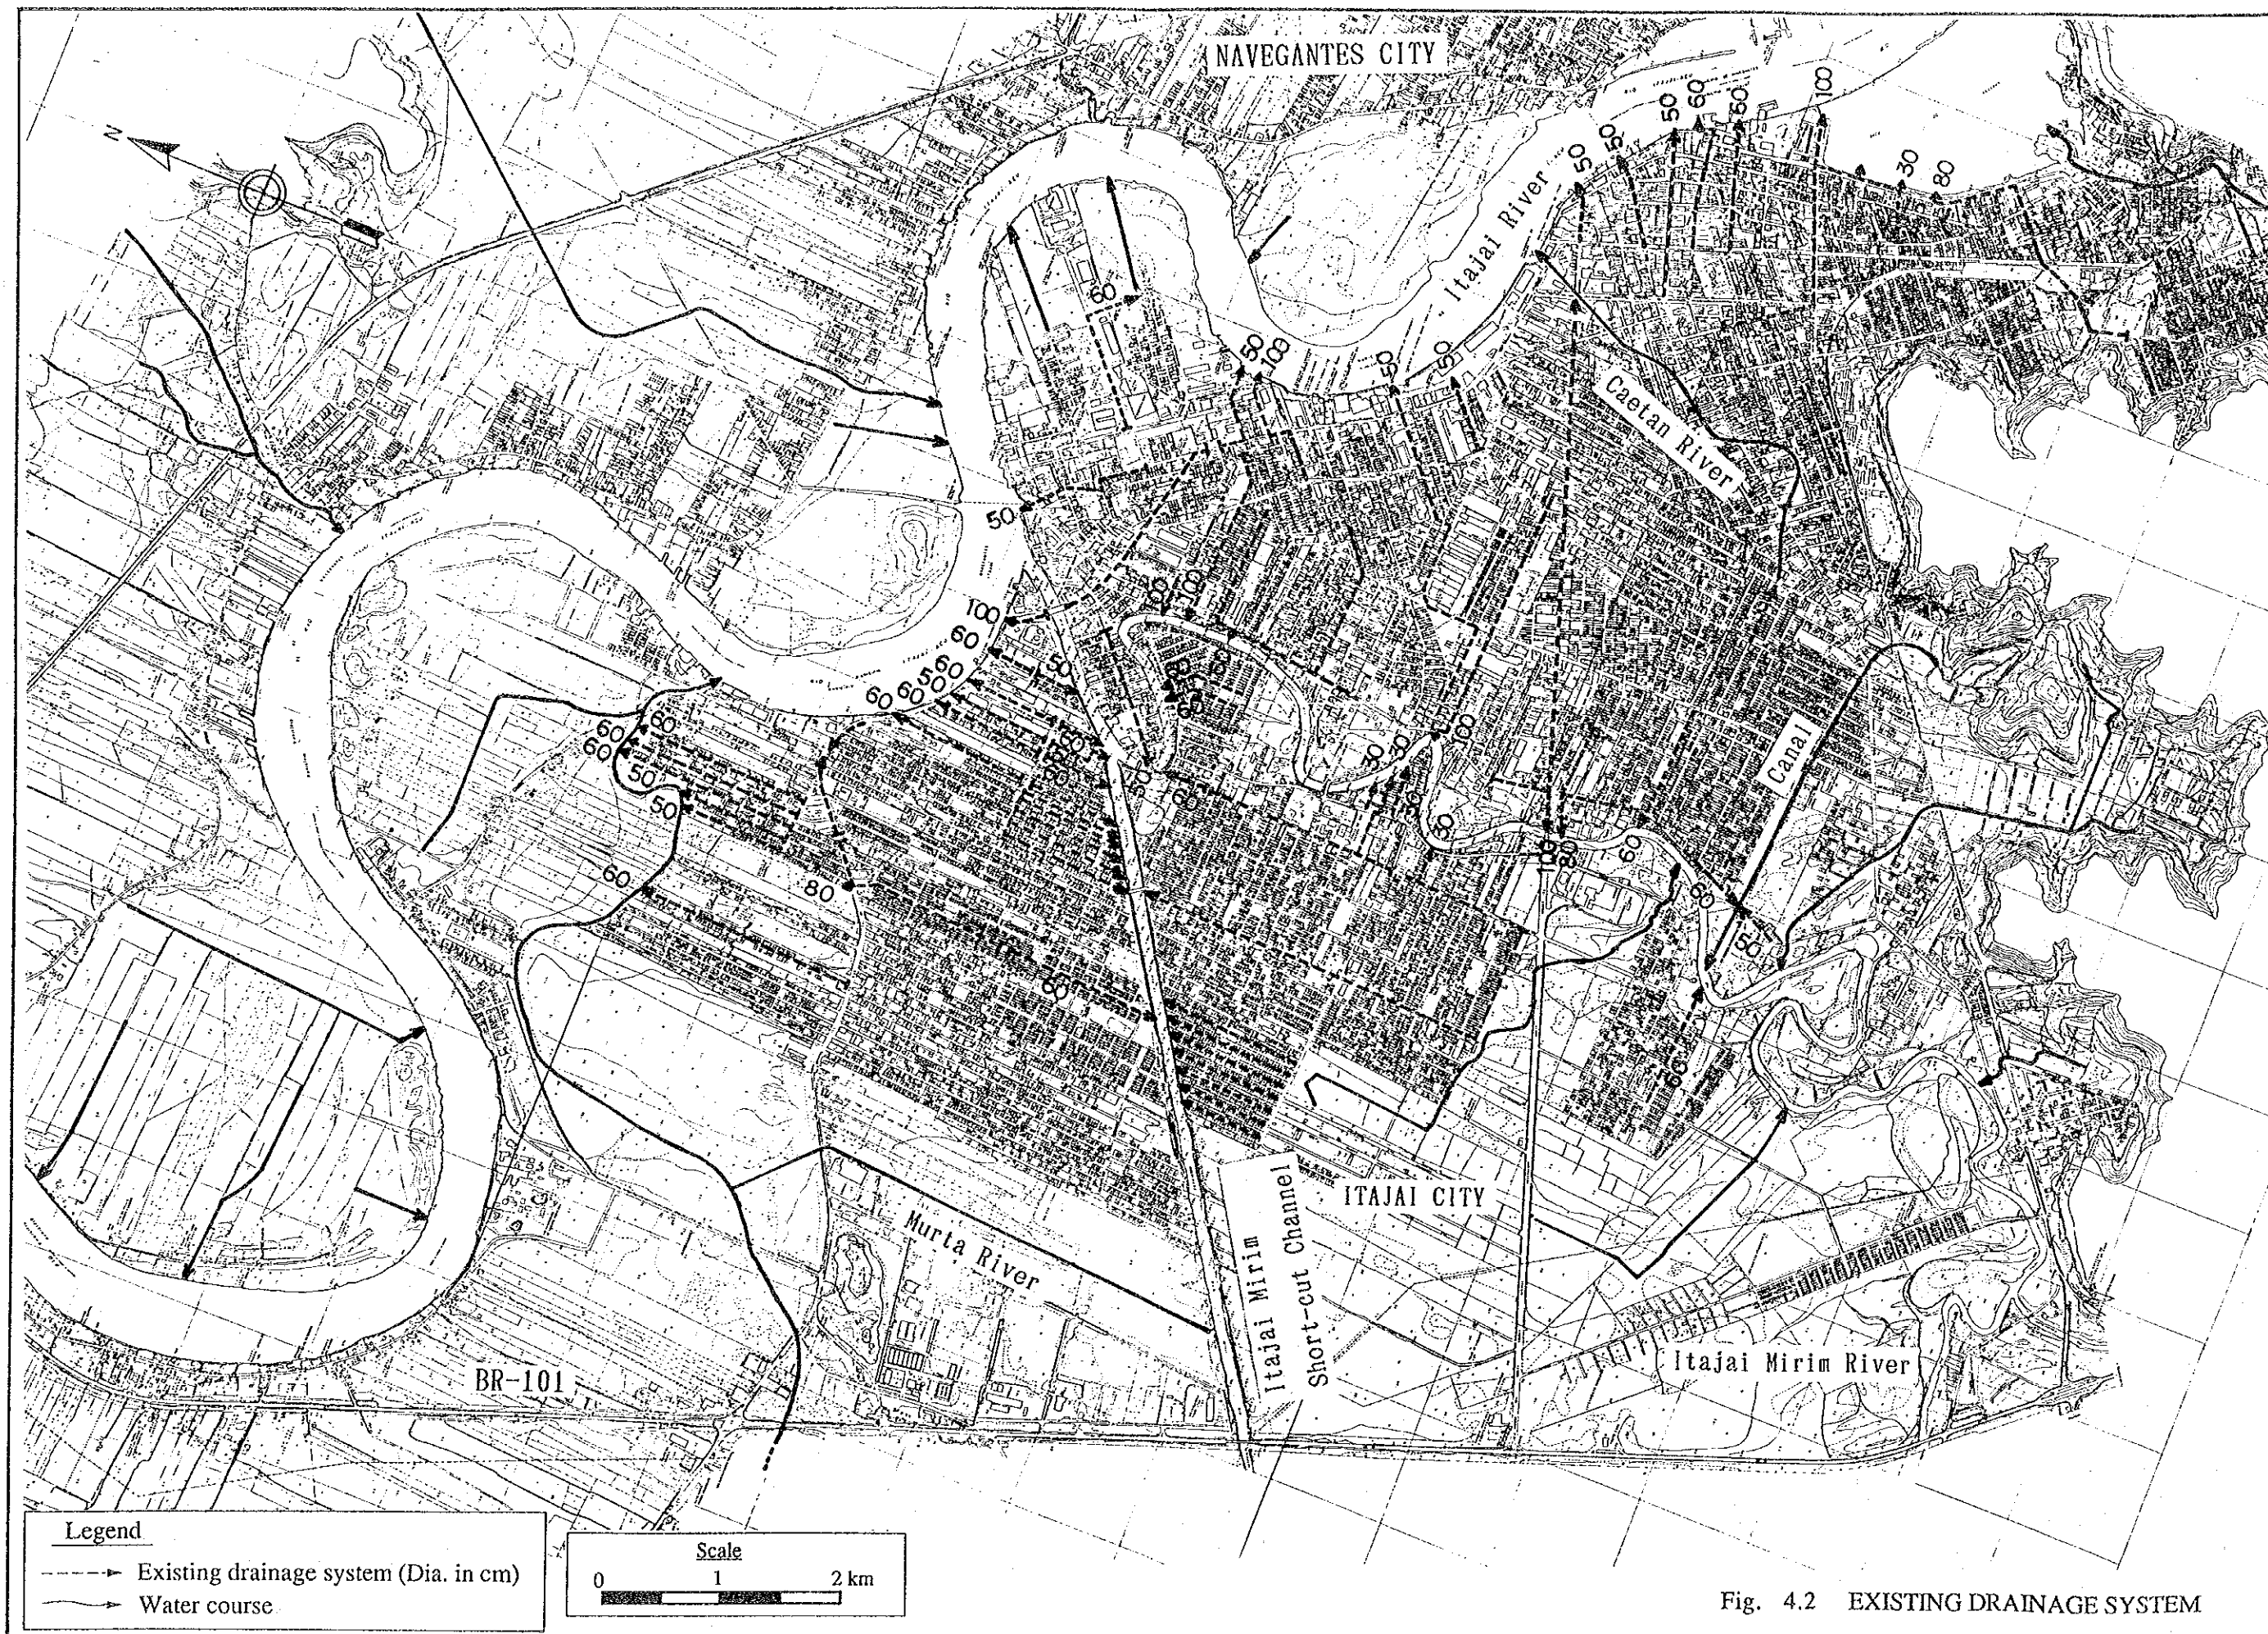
EXISTING DRAINAGE SYSTEM
